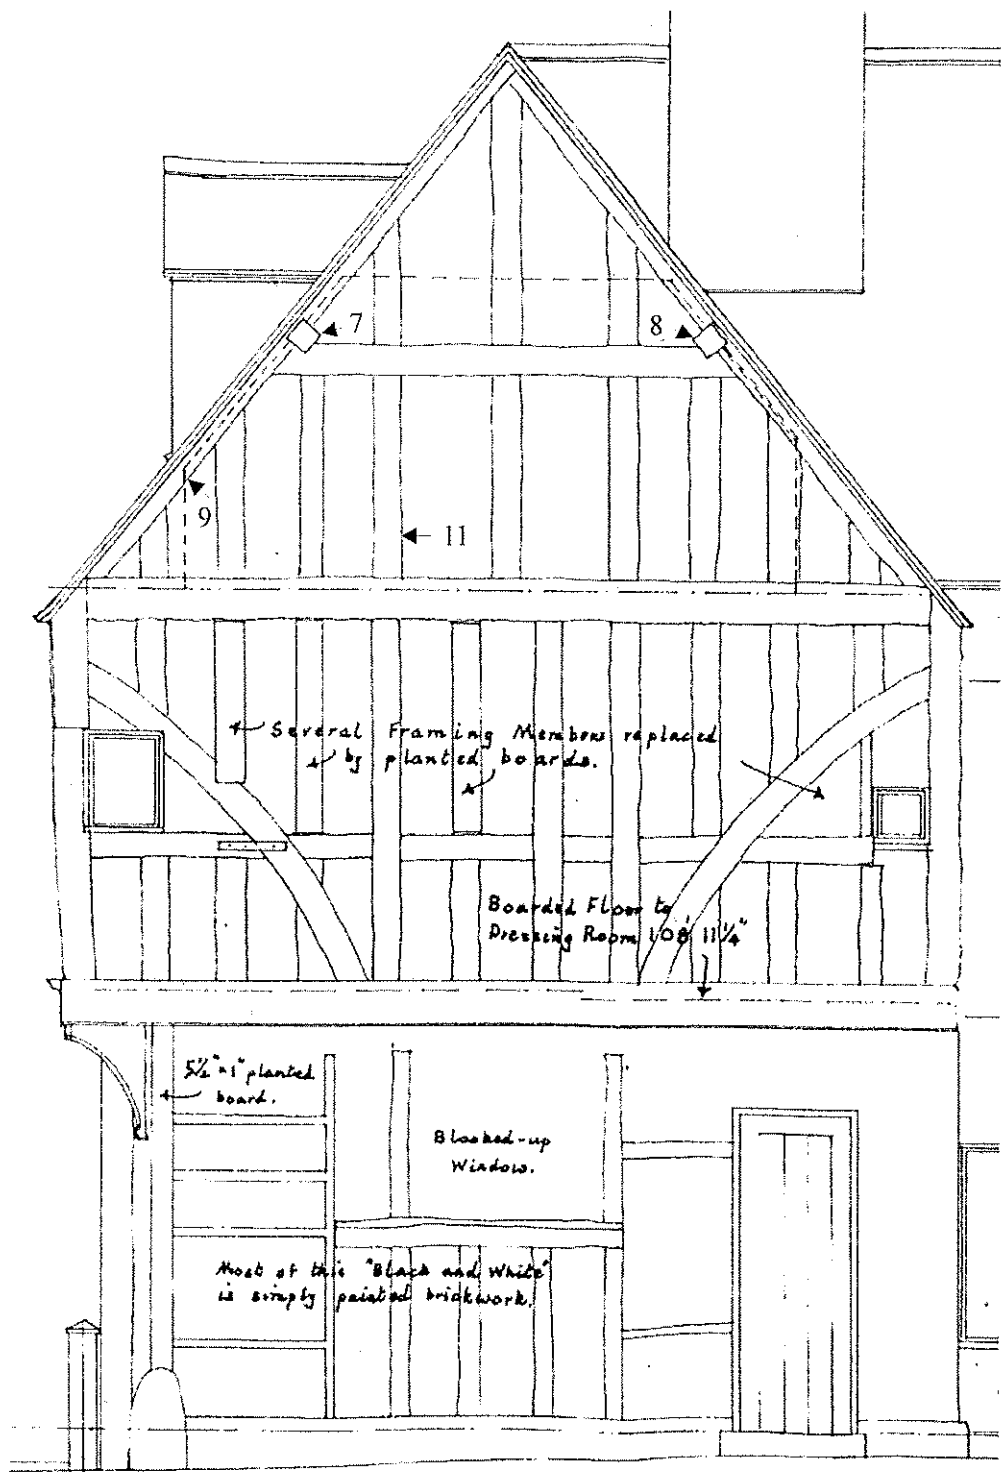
Location of samples 7-9 and 11. Side, east elevation
